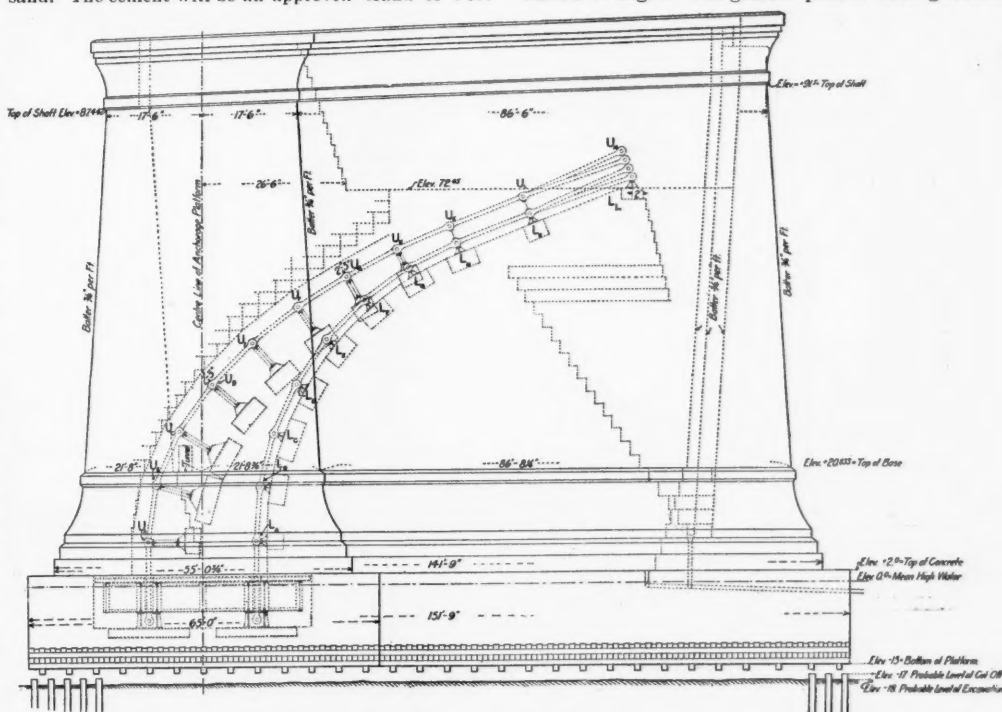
Side Elevation of Masonry Showing Position of Anchor Chains, Girders, Bearings and Tunnel—New York Anchorage, New East River Bridge.
